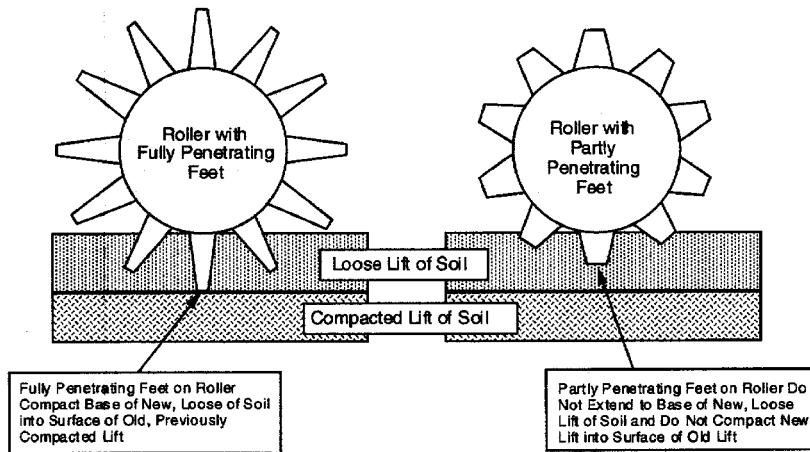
Footed Rollers with Partly and Fully Penetrating Feet.
